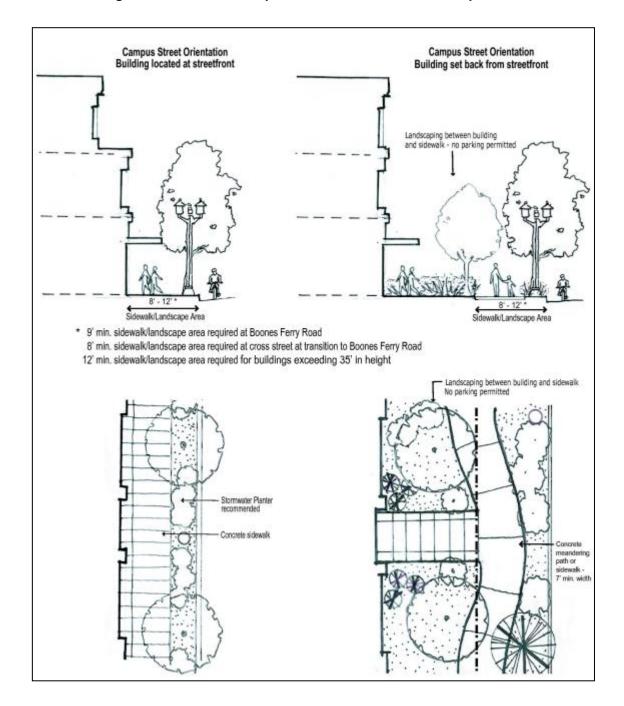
FF: Campus Street Orientation Streetscape
